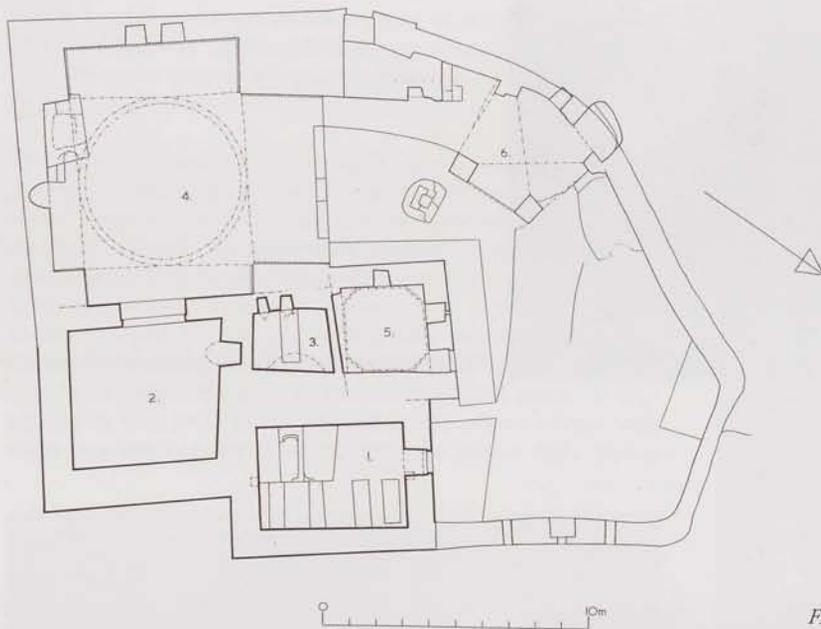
Dayr al-Shaykh (No. 43). Plan of complex.
